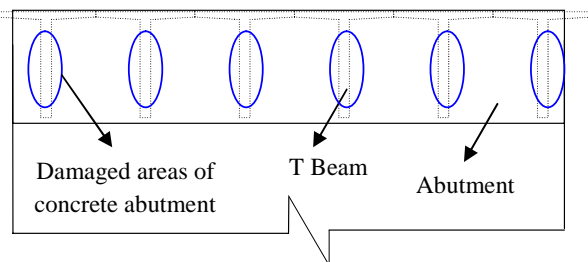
Concrete bridge abutment #14 wall indicate the damaged area
